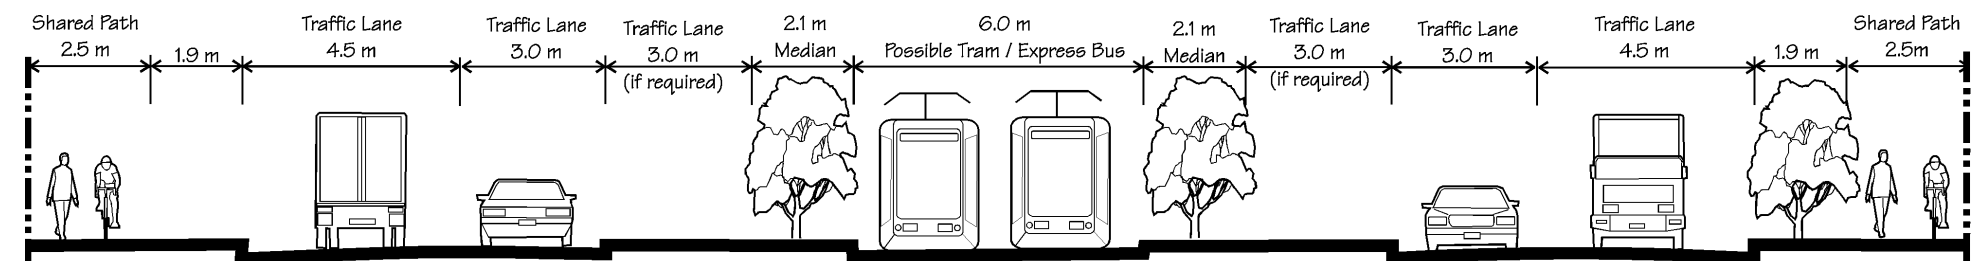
(a) Typical cross sections for Primary Arterial Roads
